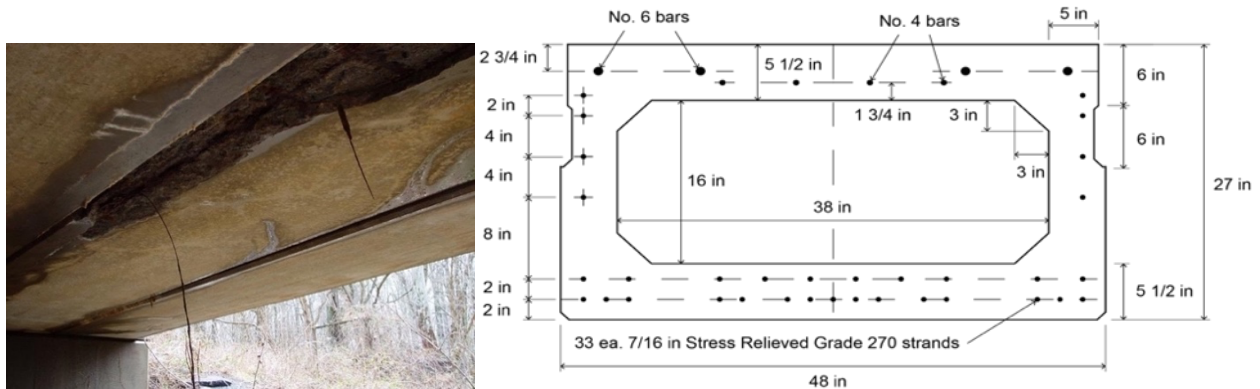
Typical corrosion damage on Aden Road Bridge (left), Cross-section of Aden Road Bridge Box Beams (right)
